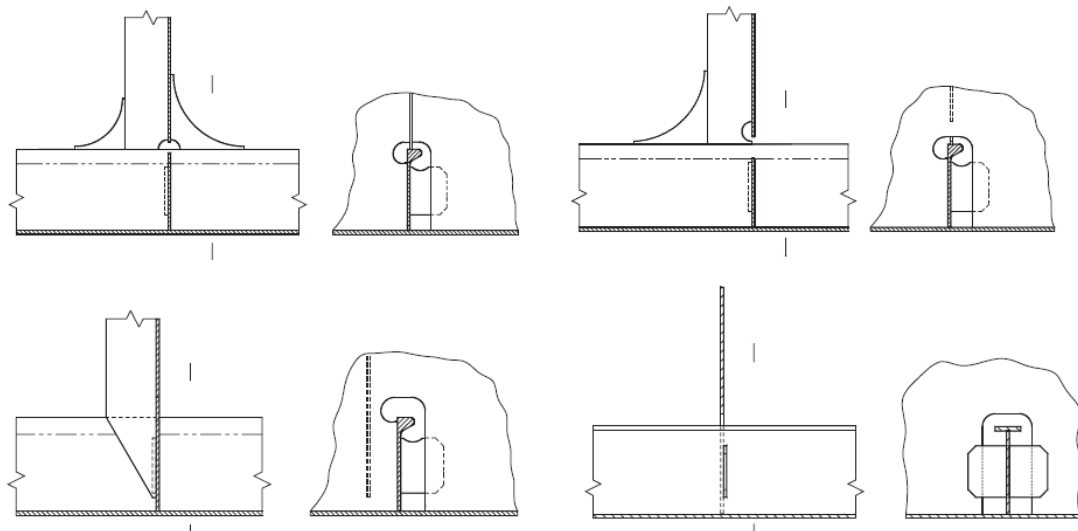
Full-scale test specimens (I. Lotsberg, 2005)
